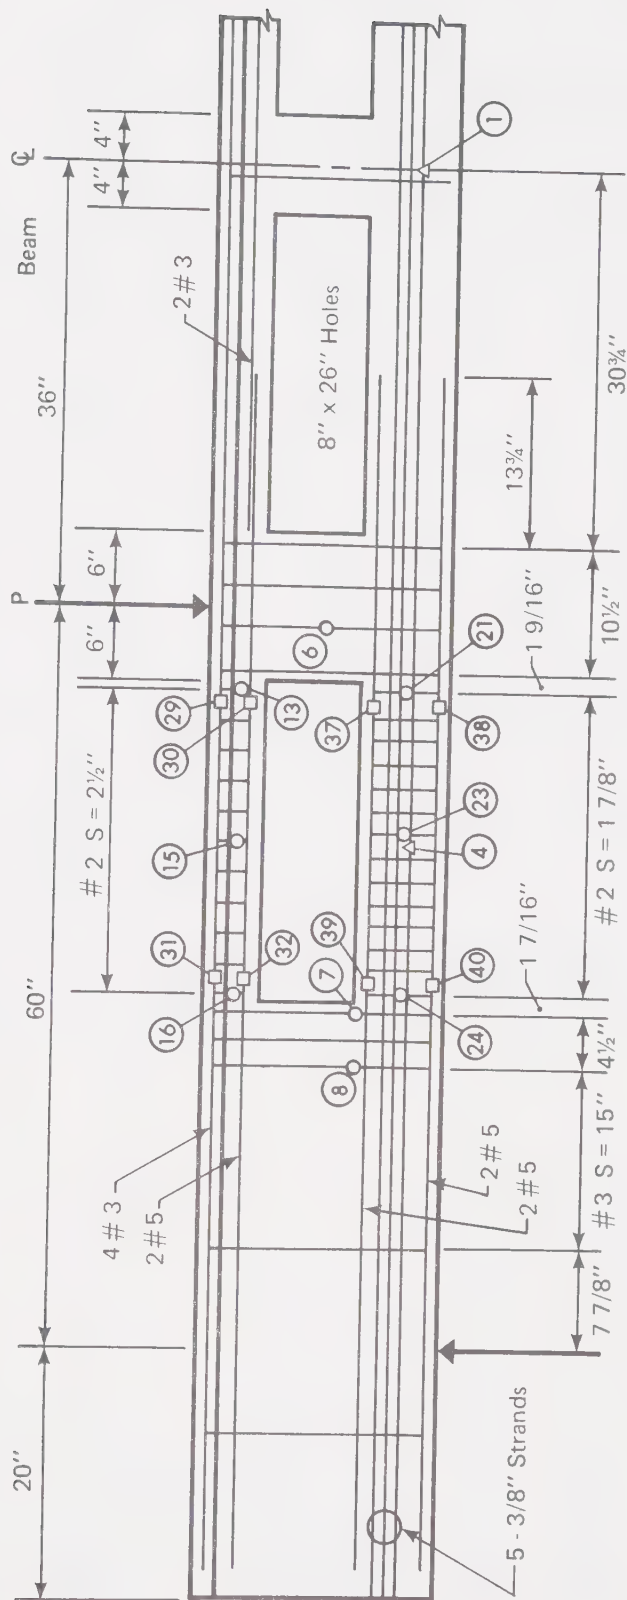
Reinforcement Details and Strain Gage Locations for Beam 21-26-5
